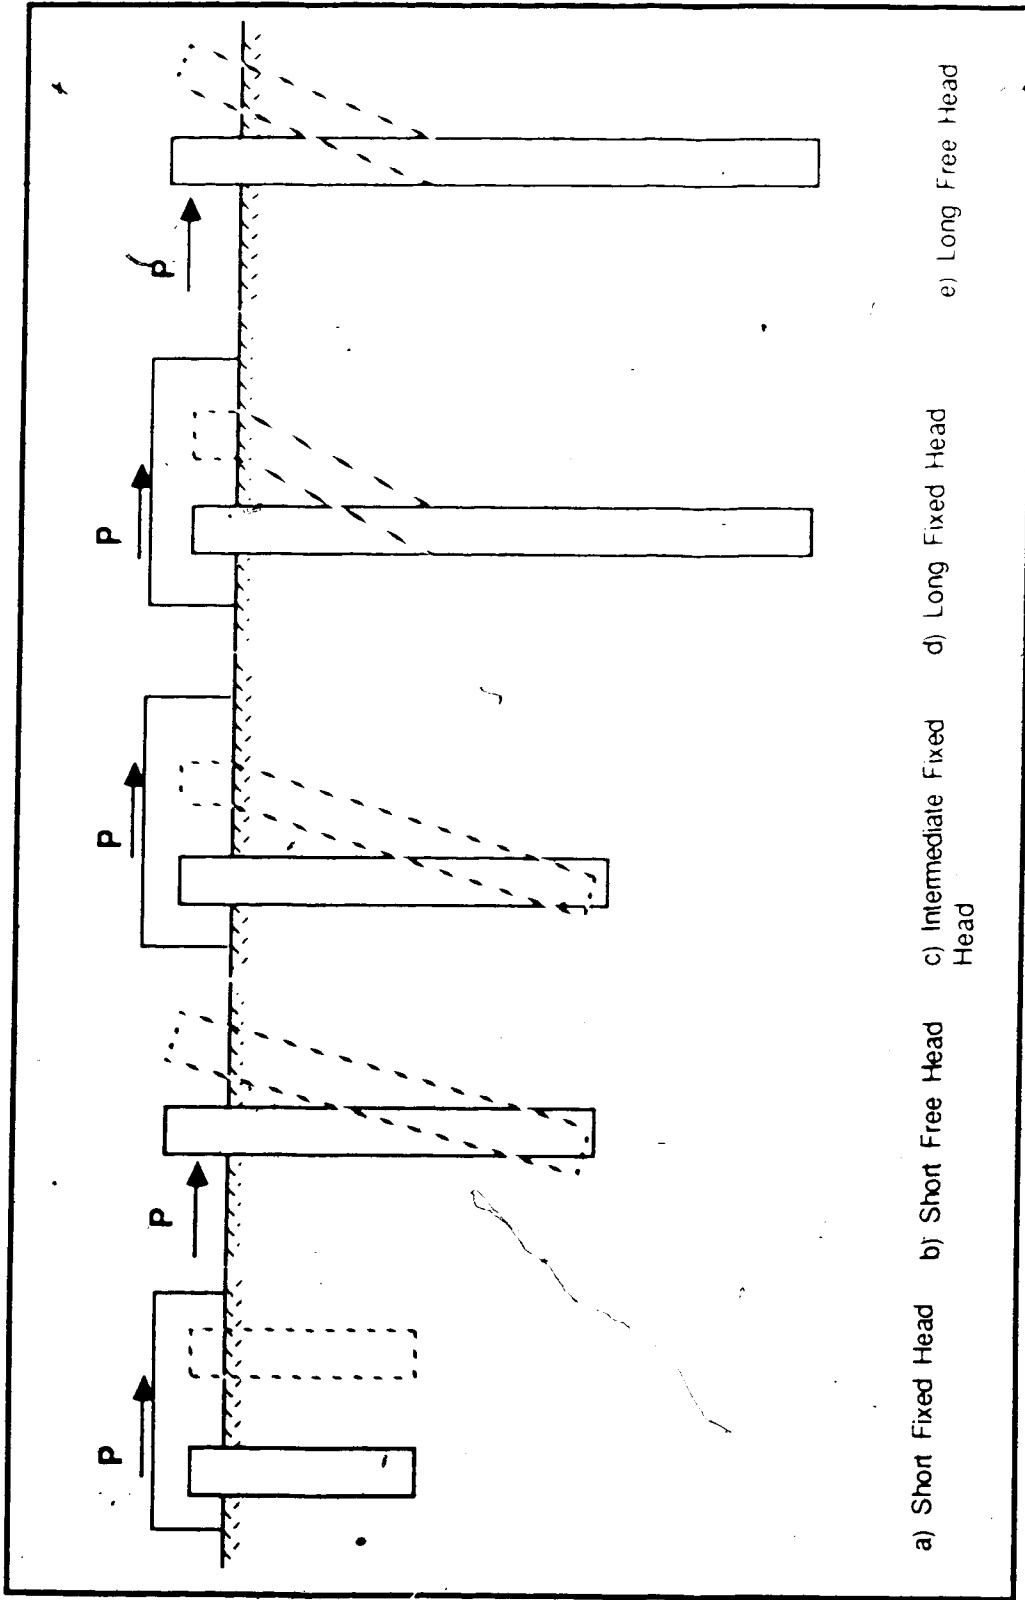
FAILURE MODES FOR LATERALLY LOADED PILES
